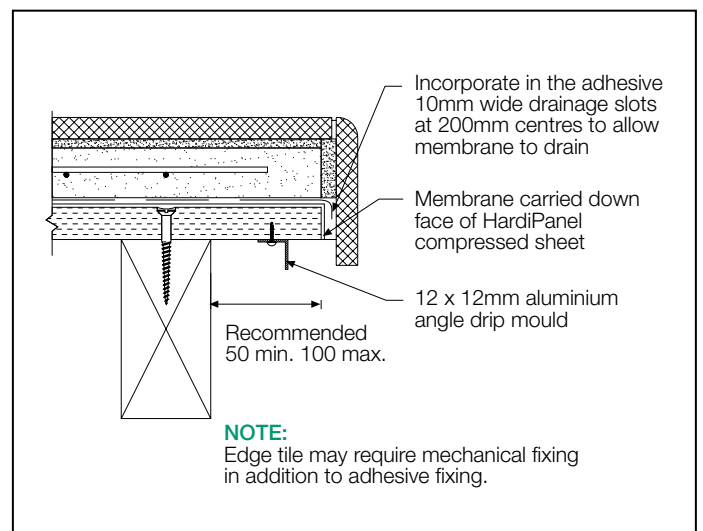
METHOD 1 - DECK EDGE DETAIL USING TILE
